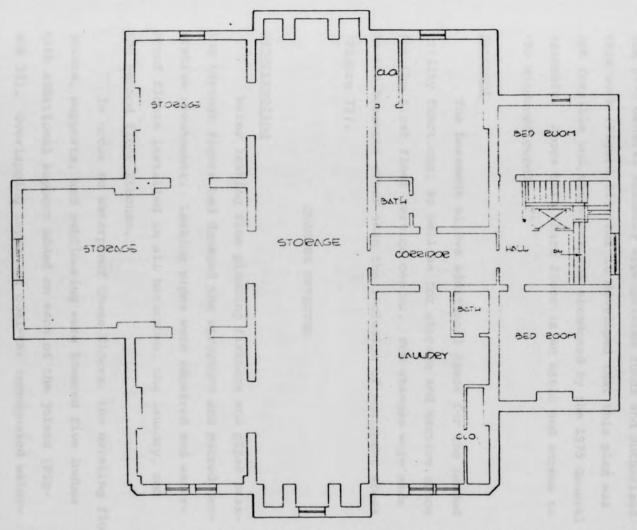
Third Floor Plan Before 1974-76 Renovation and Partial Restoration
